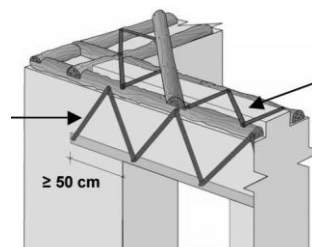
Stiffening module between lintel beam and roof beam, by CAESI
